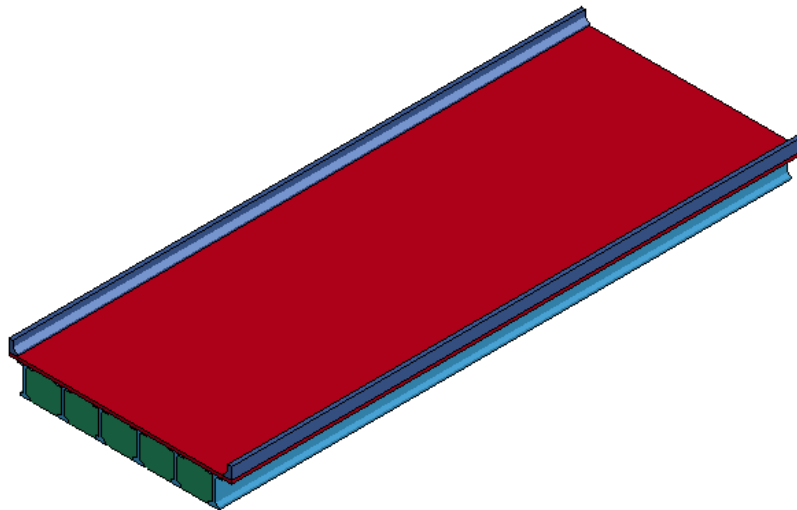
3-D View of Archetype 4 Bridge Model.
